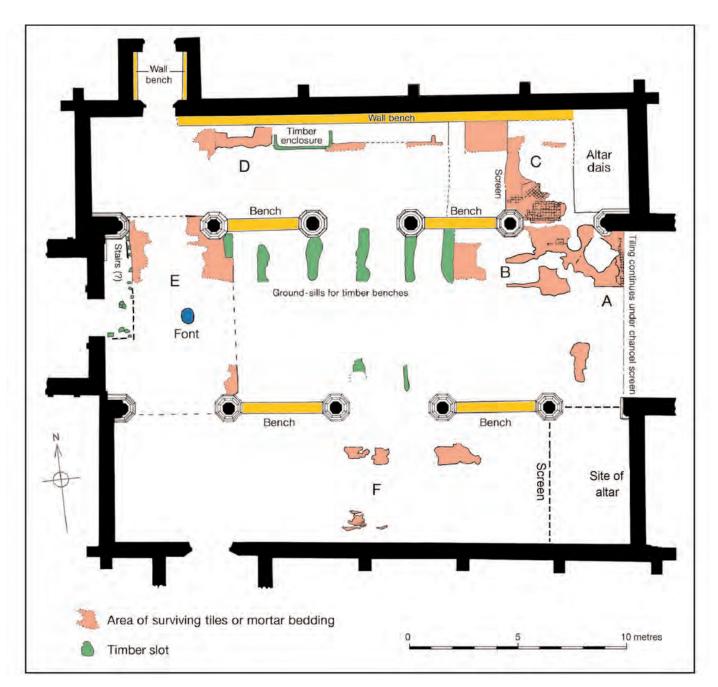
Nave and aisles. Plan showing surviving patches of floor tiling (lettered A to F), stone and timber bench positions, and other principal features of the fourteenth and fifteenth centuries. Scale 1:175. Drawing: Warwick Rodwell
